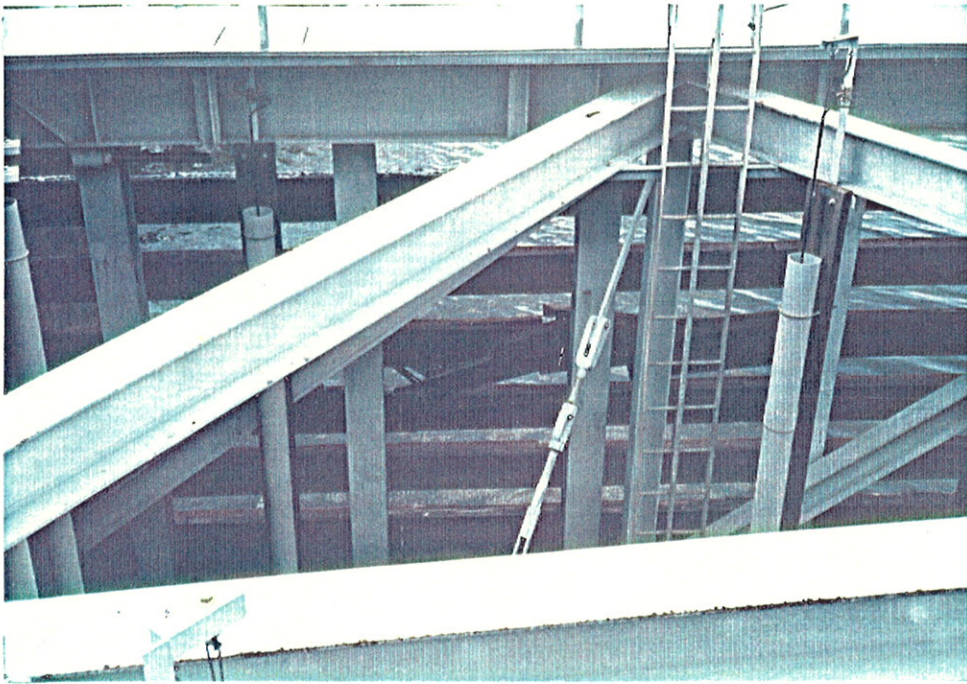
Damaged member of a timber fender on a sector gate.
